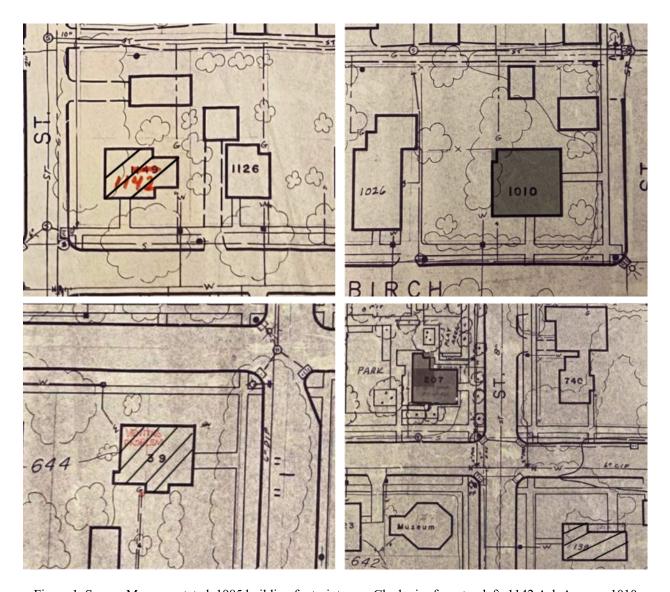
Survey Map, annotated. 1985 building footprint map. Clockwise from top left: 1142 Ash Avenue, 1010 Birch Avenue, 207 H Street, 138 H Street and 39 I Street.
